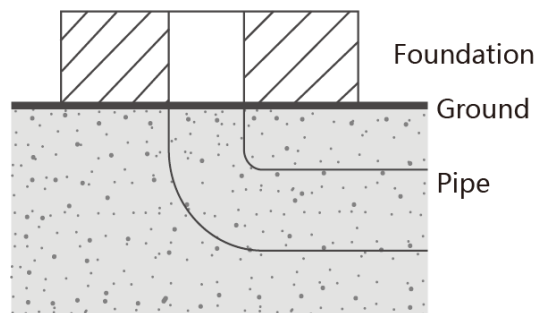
Construct Foundation for Wall-Mount Charger
